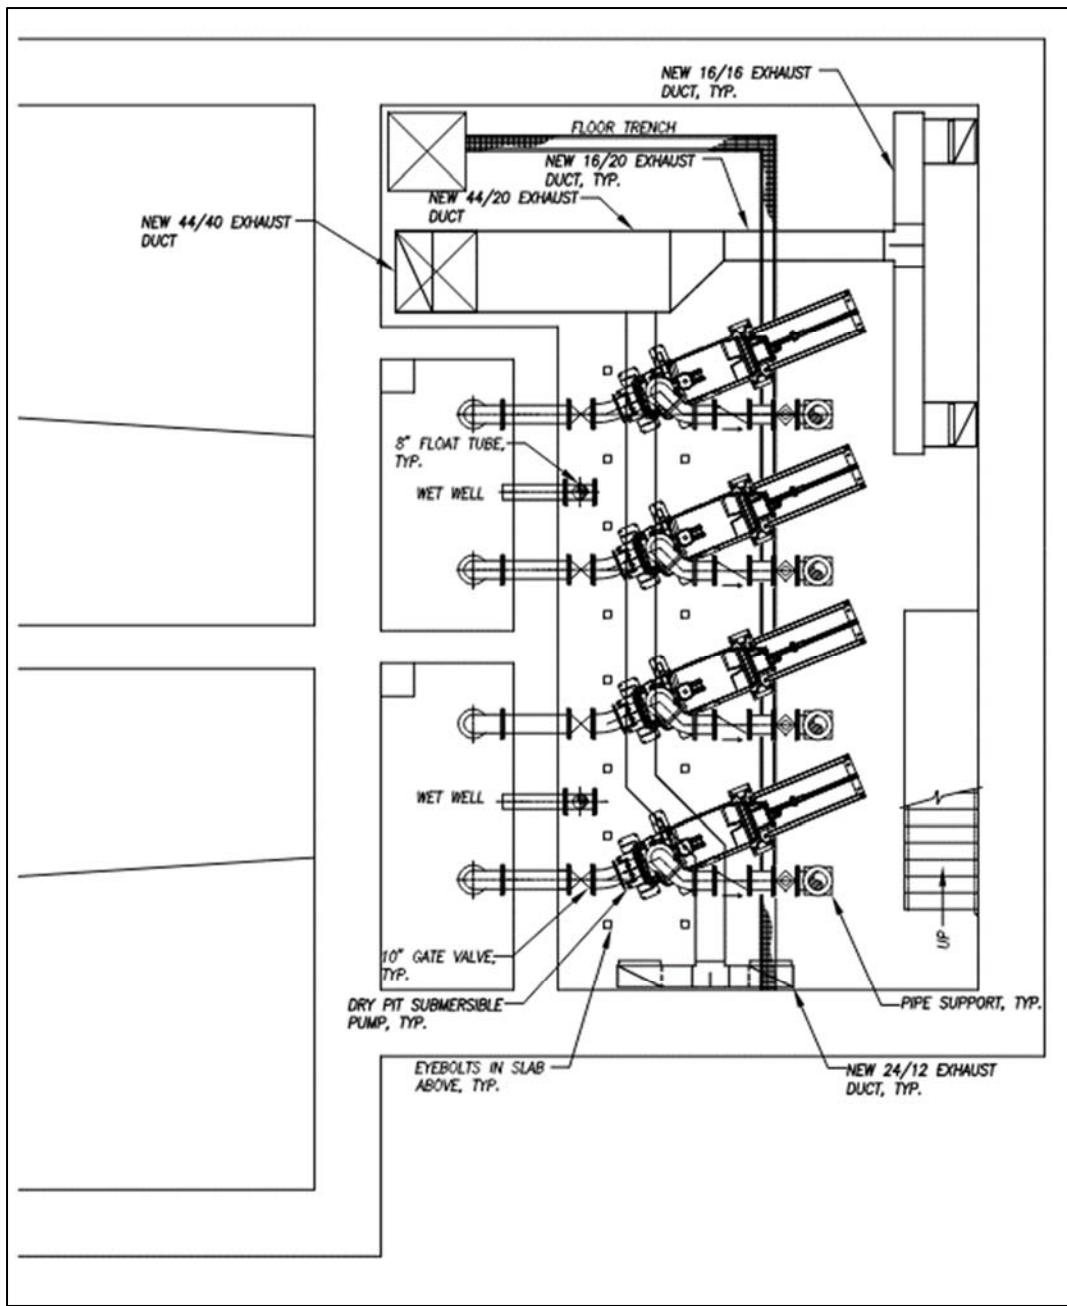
EPS with New Dry Pit Submersible Pumps (Constant Speed) - Plan View
